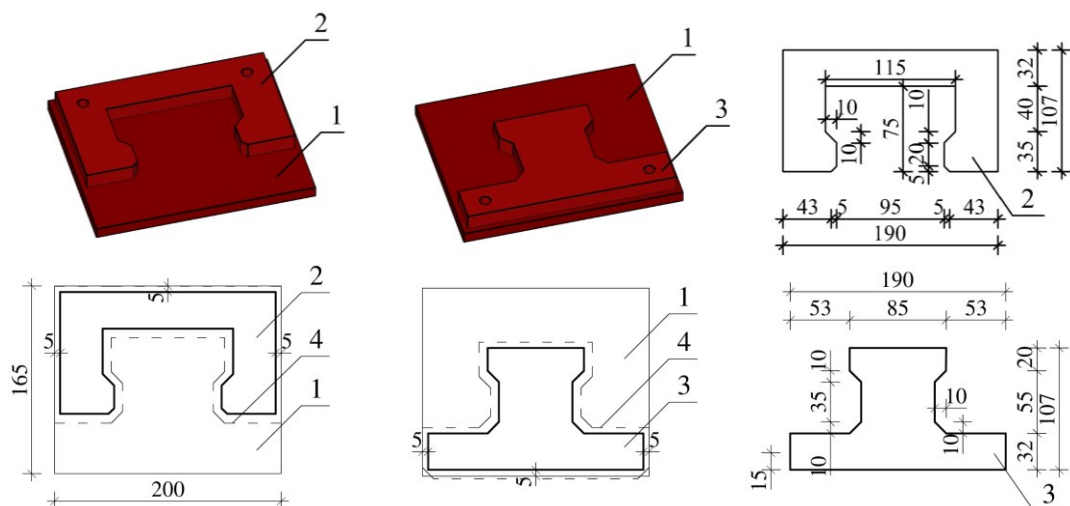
Force transfer steel plate: 1- main steel plate, 2- overlay steel plate, 3- precast steel plate, 4- precast and overlay cross-section outline
